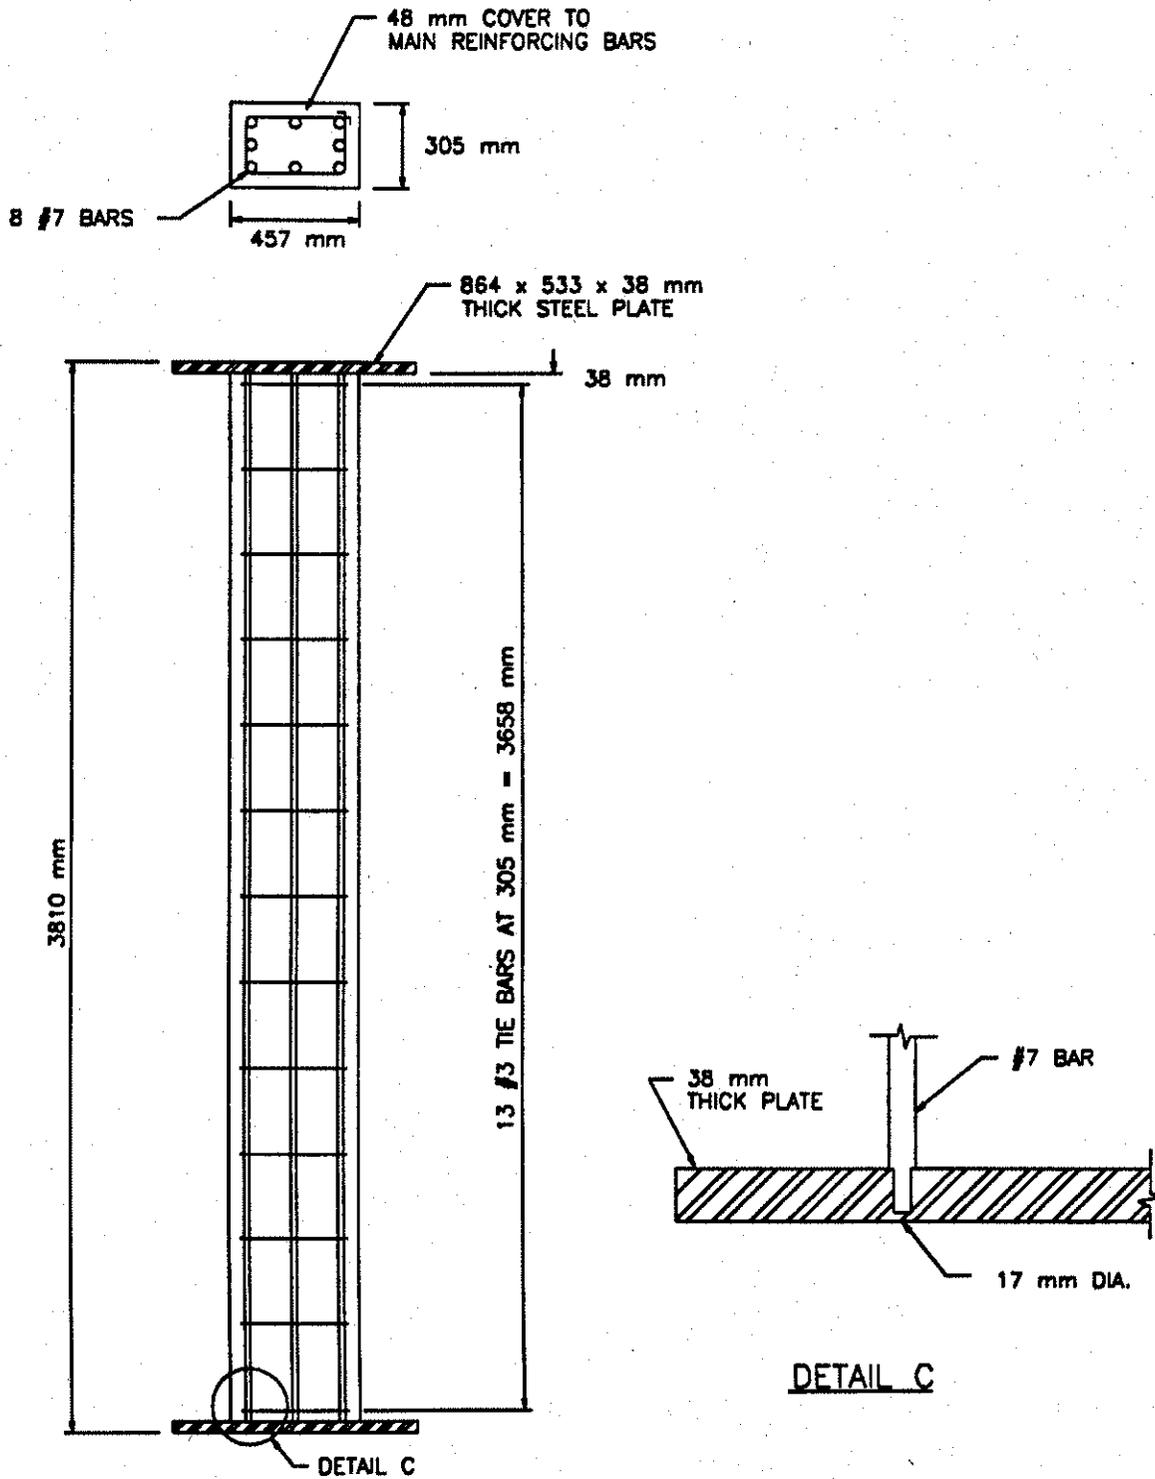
ELEVATION, CROSS-SECTION AND FINISHING DETAIL:
